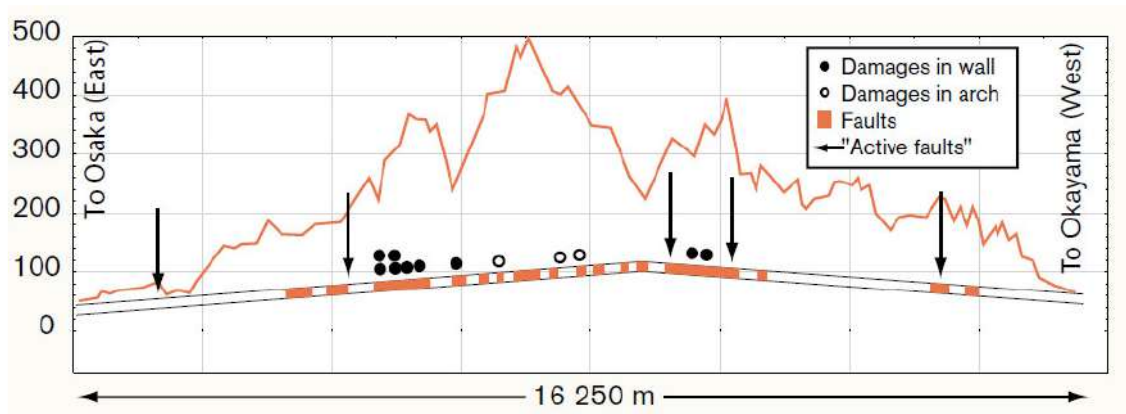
Damage at the Rokko tunnel by the 1995 Kobe earthquake (Asakura and Sato, 1998)
